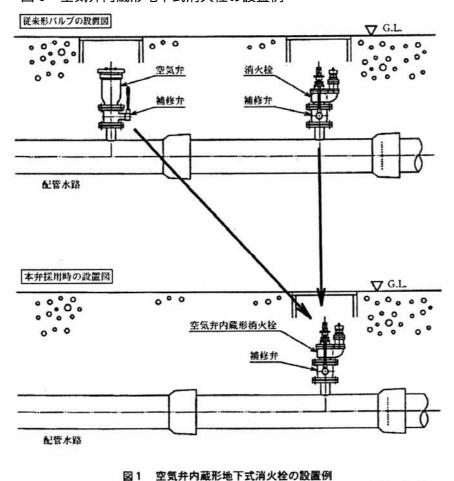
Example of installation of Air Valve Built-in type Underground Fire Hydrant
